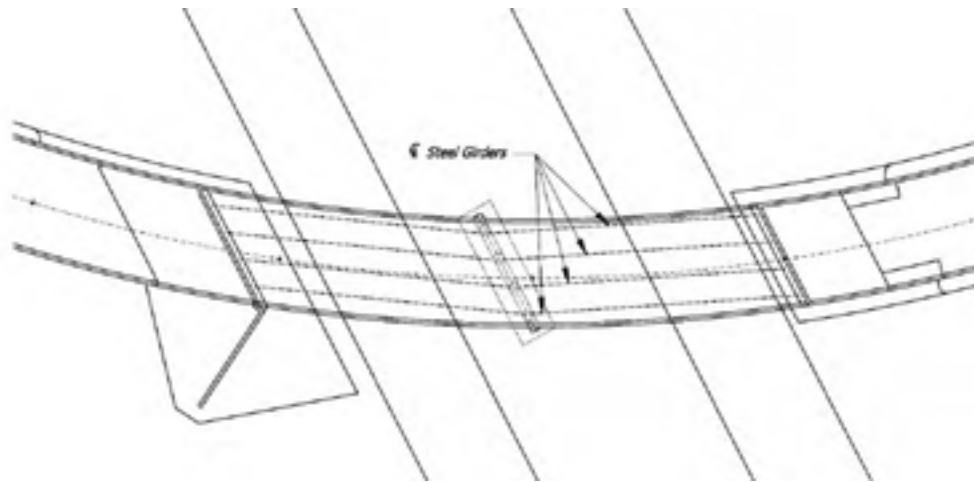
Plan view of a curved bridge with piecewise straight girders.
